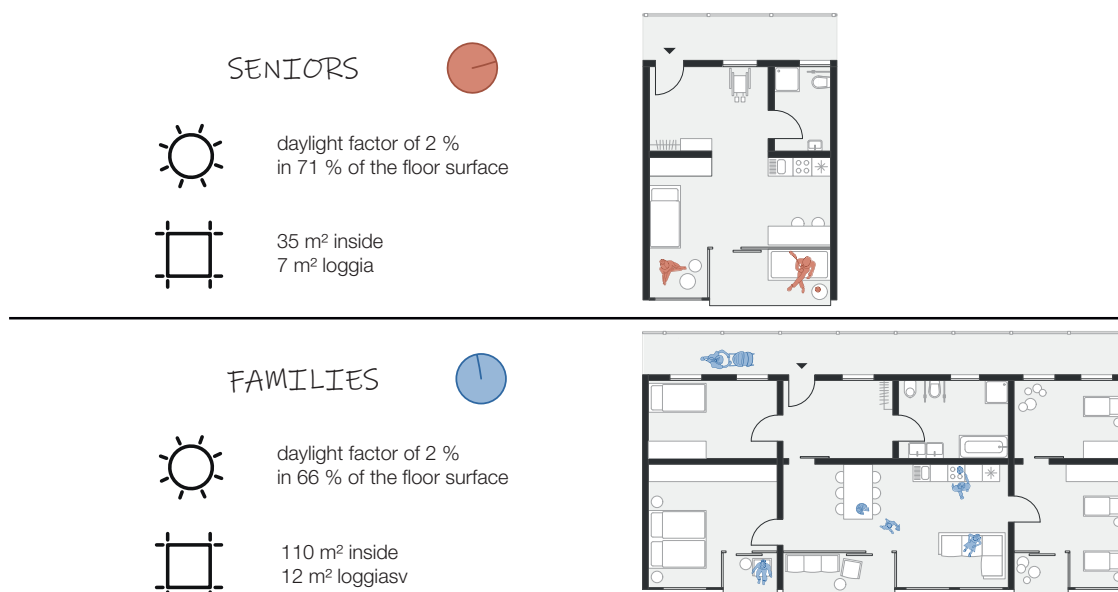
Detailed floor plans of two out of the four household types (seniors and families).
